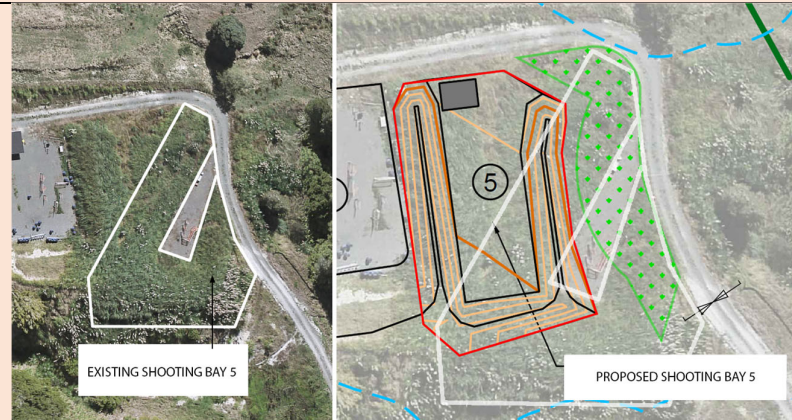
Demonstration of the location of existing and proposed shooting bay 5 (more details see drawing RC113, RC200 of Appendix C - Infrastructure Report & Plans (Rev B))
